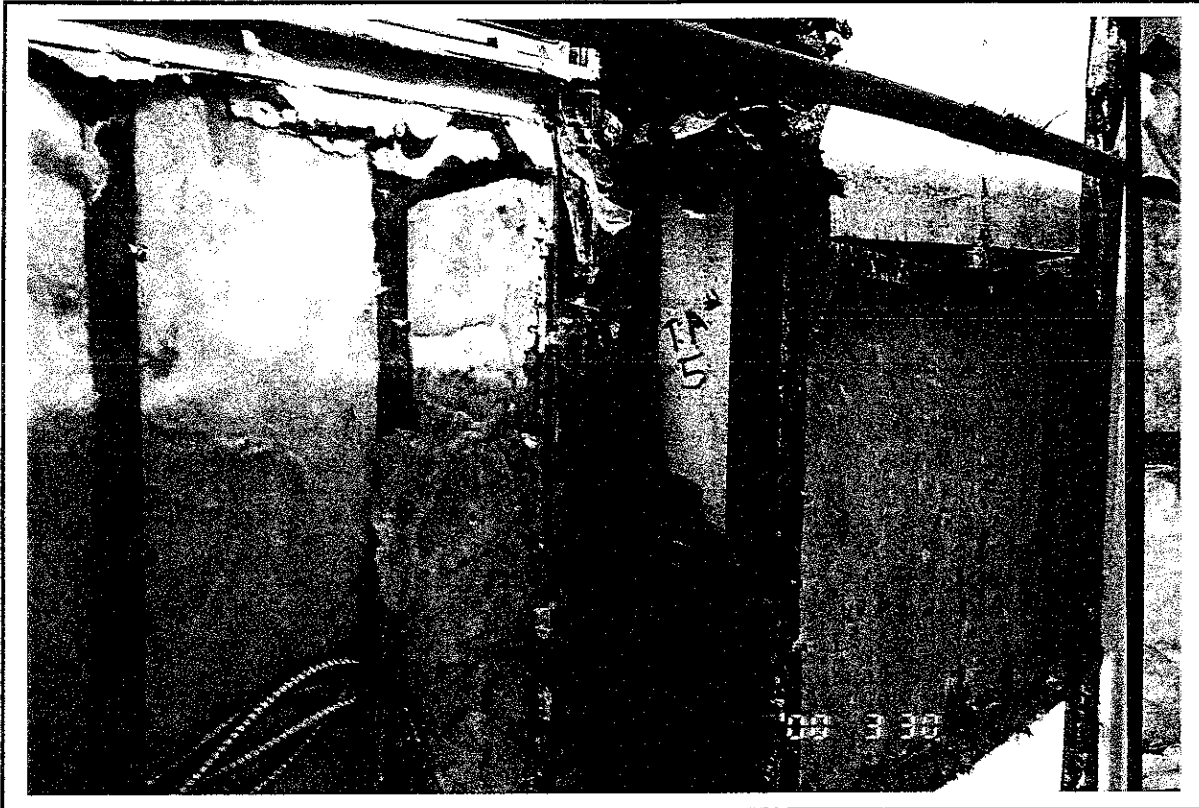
Test Area #5 – Corrosion of steel studs at column & below window
